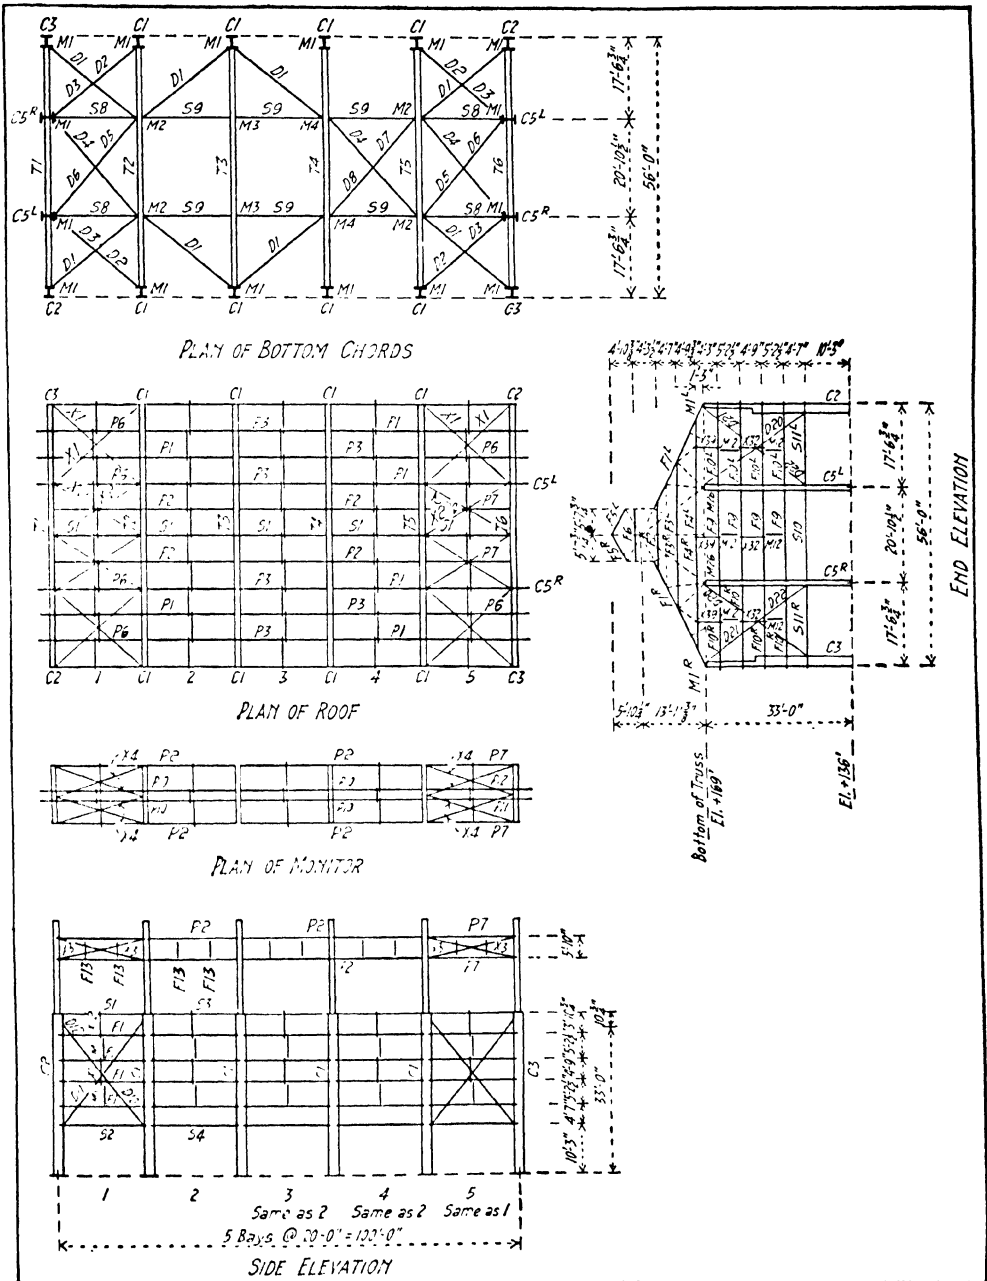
ERECTION PLAN OF A STEEL MILL BUILDING.
